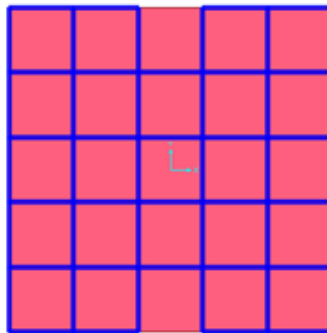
Typical plan (25×25) of building models of RC frame shear wall structures
